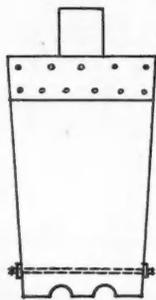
Timber Strut for Trussed Beam Where Three Pieces are Used.
